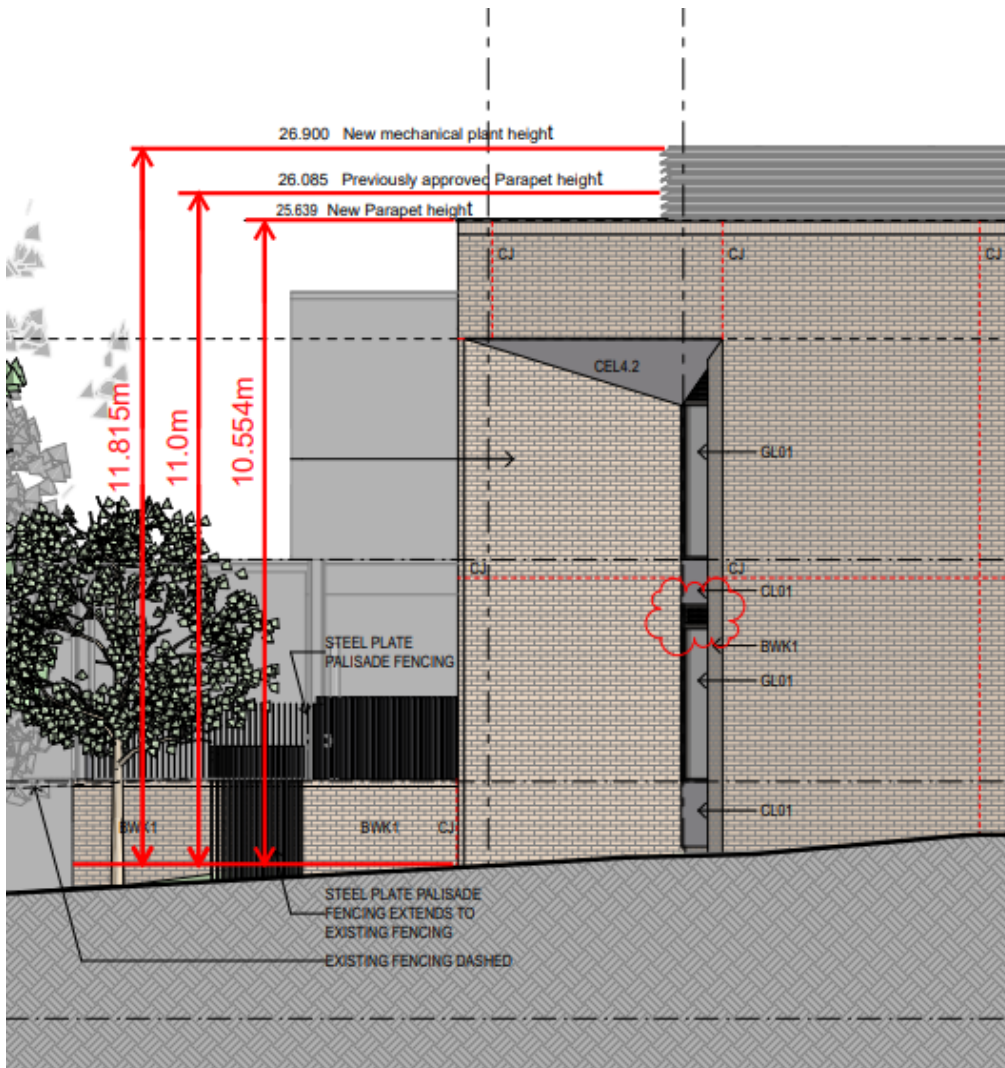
Western Elevation – Previously Approved/ As Proposed (zoomed)
